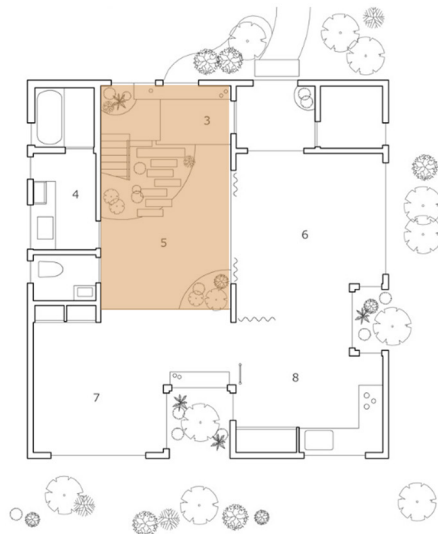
Kojunaki House Floor Plan (grieco, 2011)
